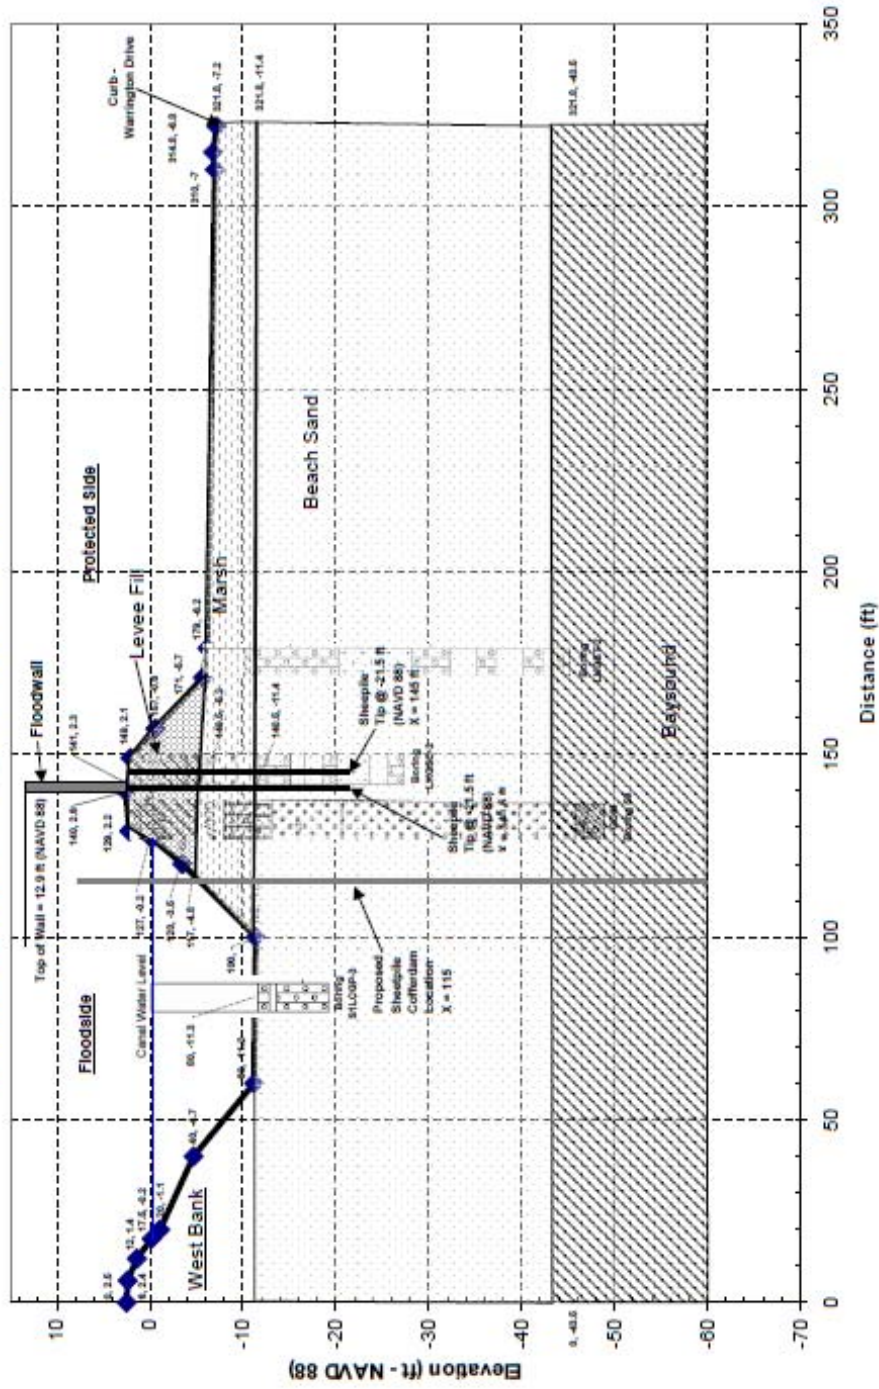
Subsurface Profile at about GDM Station 8+75 (Test Section Centerline)
